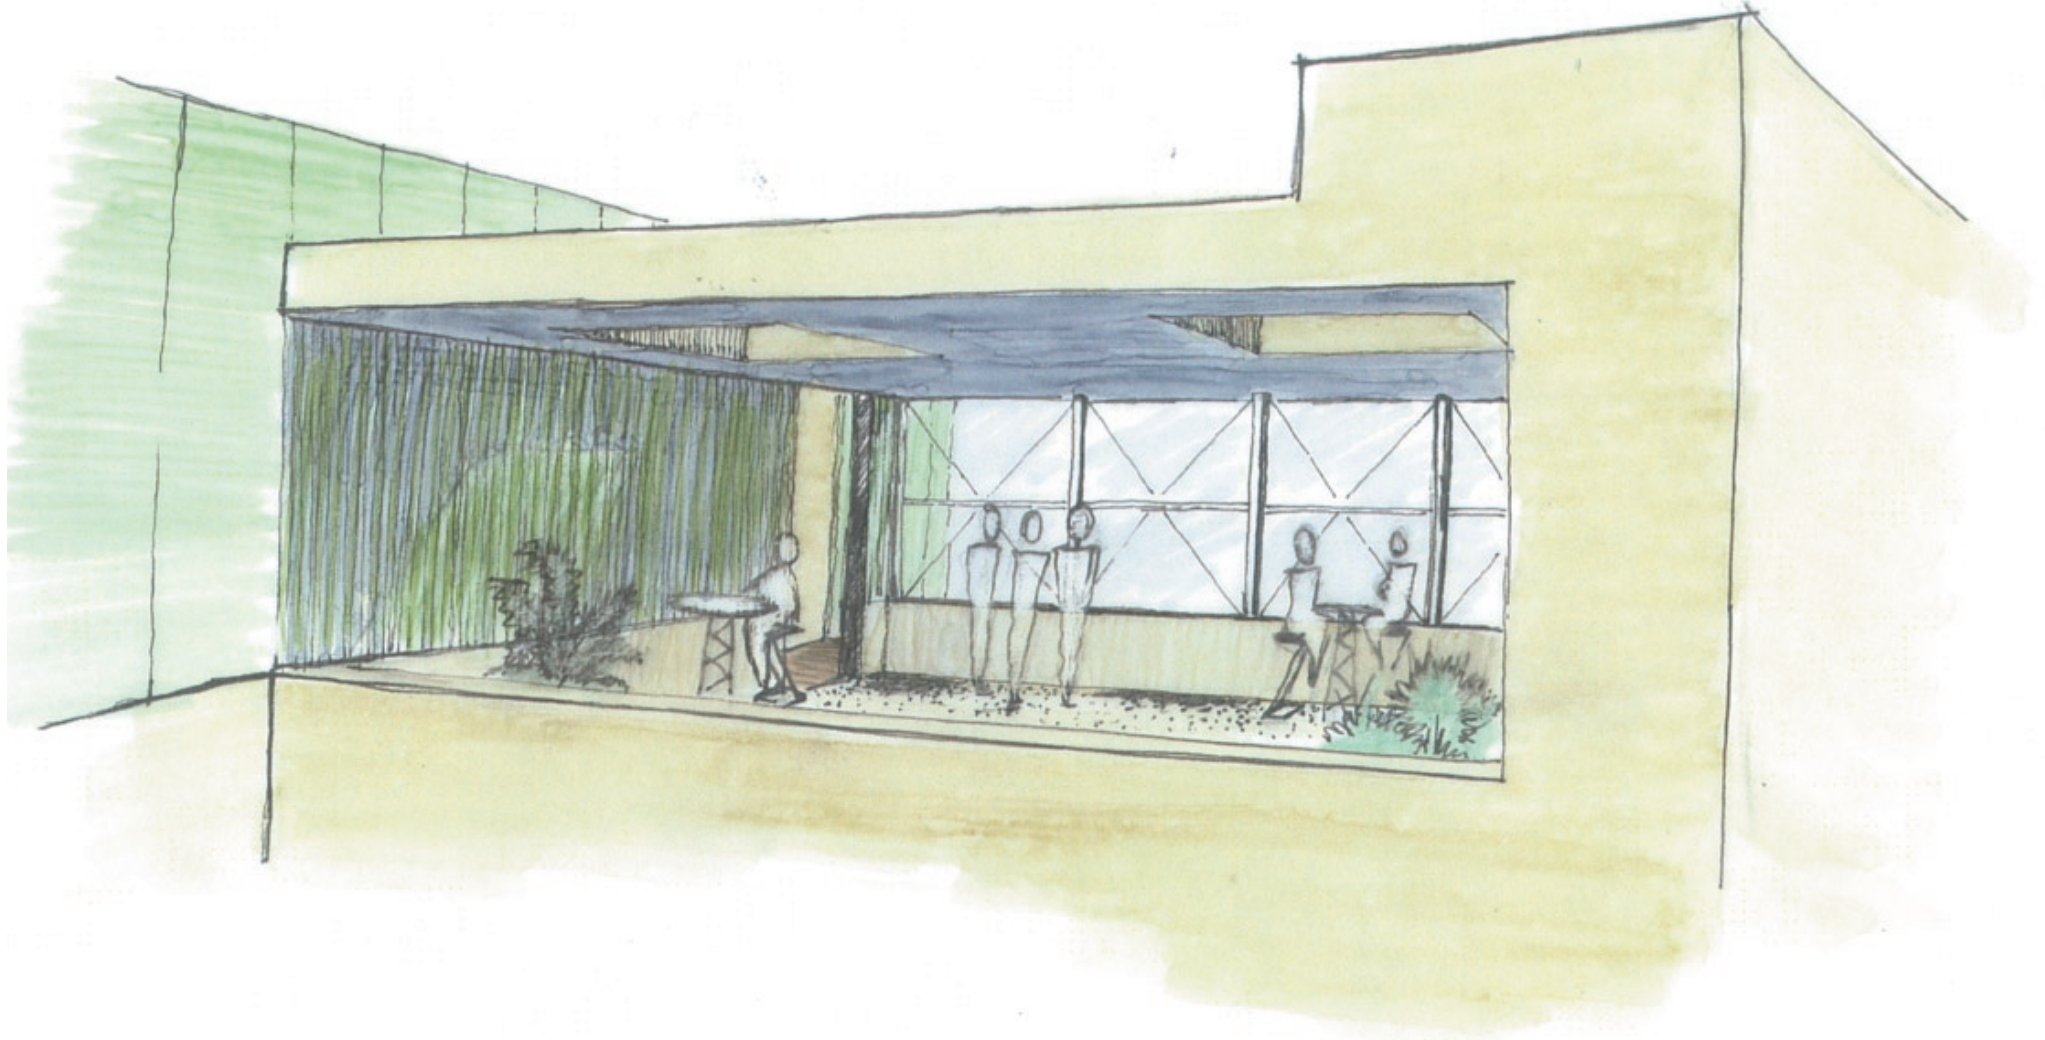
Looking toward the classroom on the third floor - curved walls express movement around corners.
